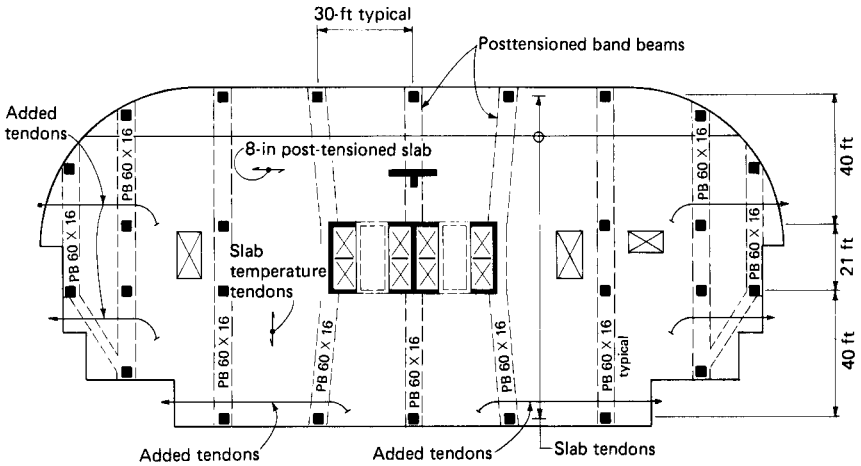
Typical floor plan of posttensioned band beam and slab system.
